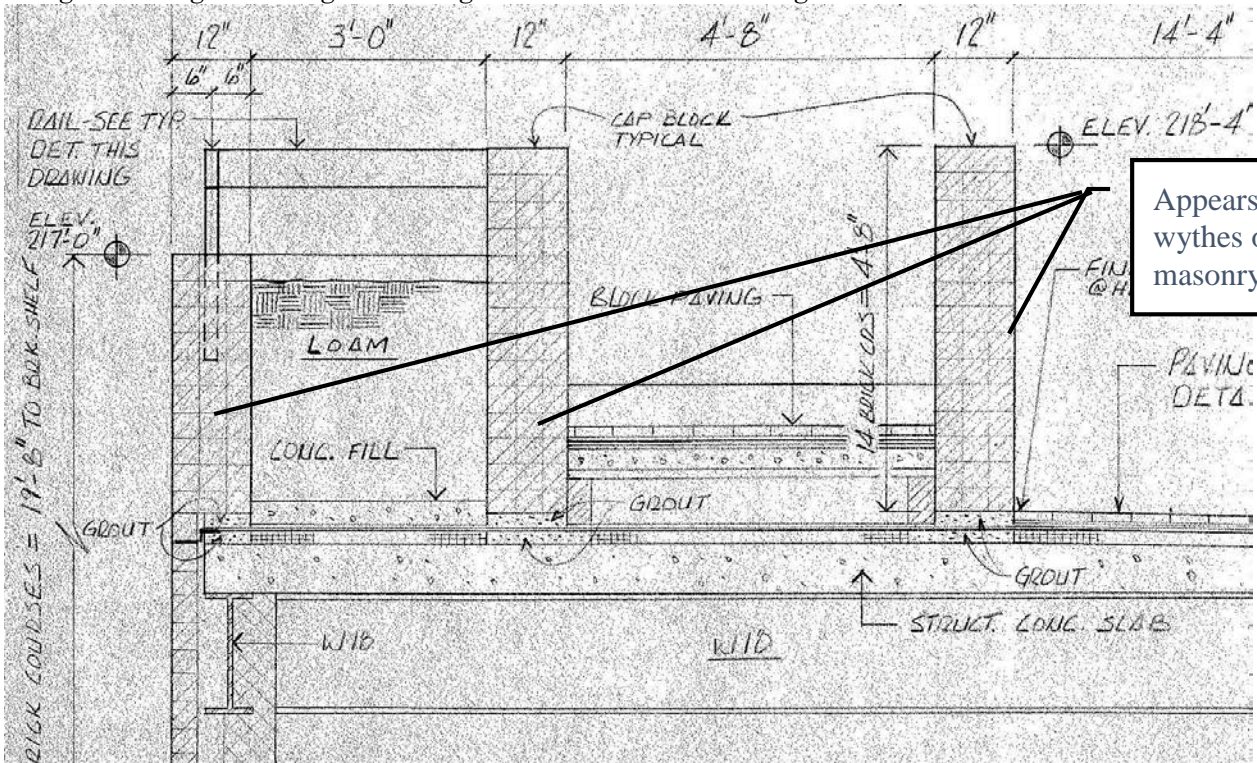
Image E – original design drawing with industry standard brick masonry unit hatching within the planter walls.
